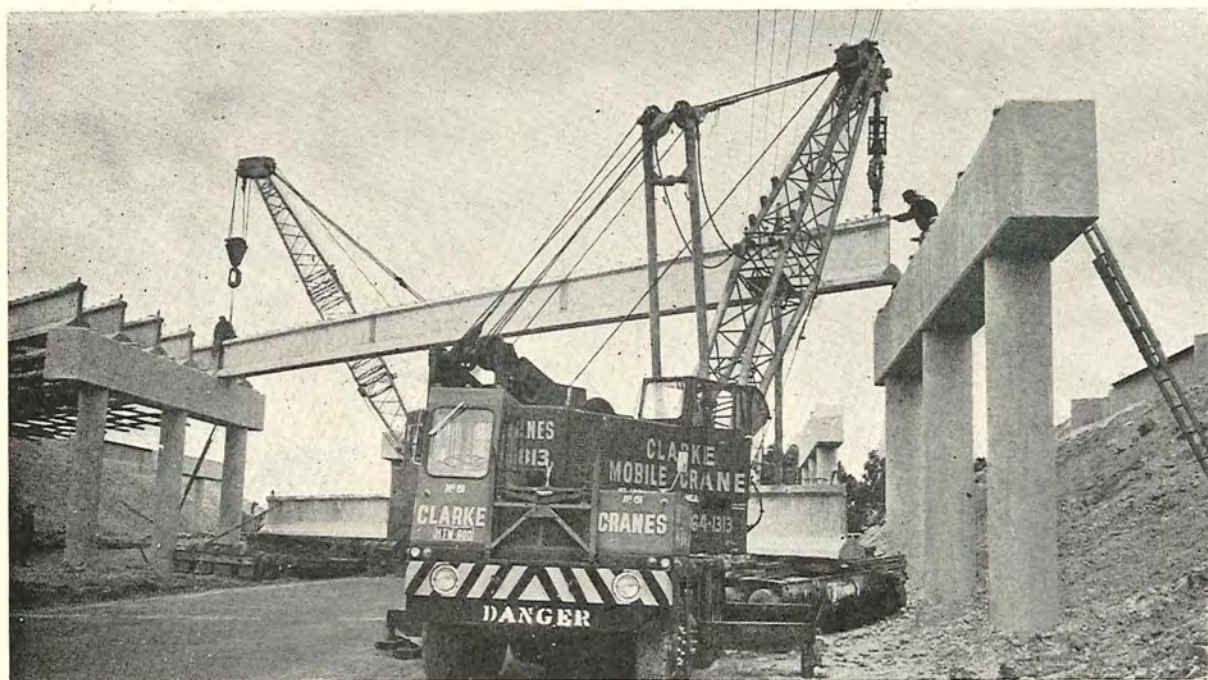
Dual bridges under construction at the Mickleham Road intersection—Tullamarine Freeway—City of Broadmeadows.
